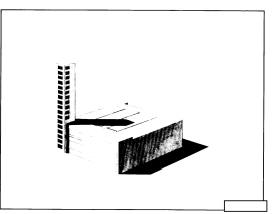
PERSPECTIVE DRAWING OF THE PROBABLE FABRICATION/ASSEMBLY BUILDING WITH A POSSIBLE CHECKOUT TOWER. (See item 98, Figure 2.)
